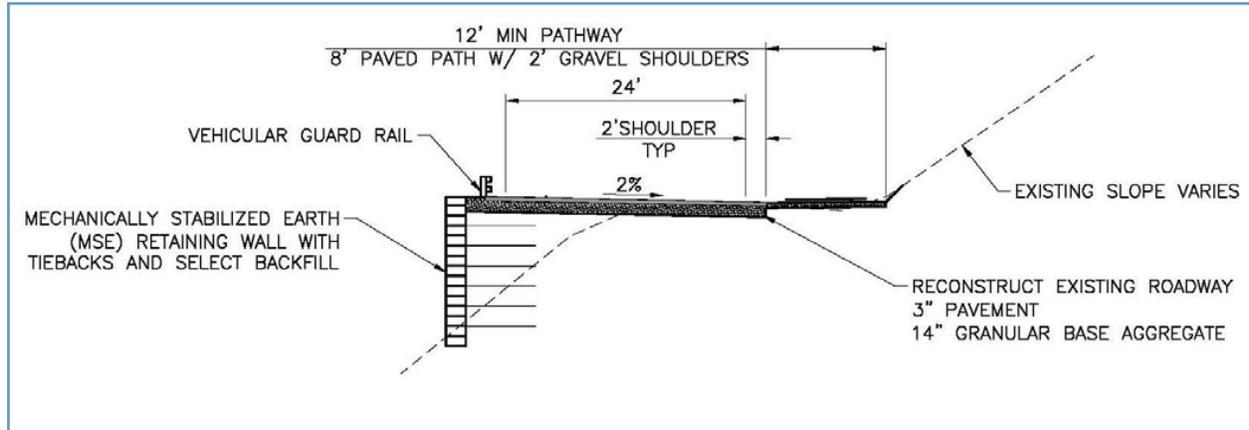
UPPER ROADWAY SECTION PATHWAY RENDERING
